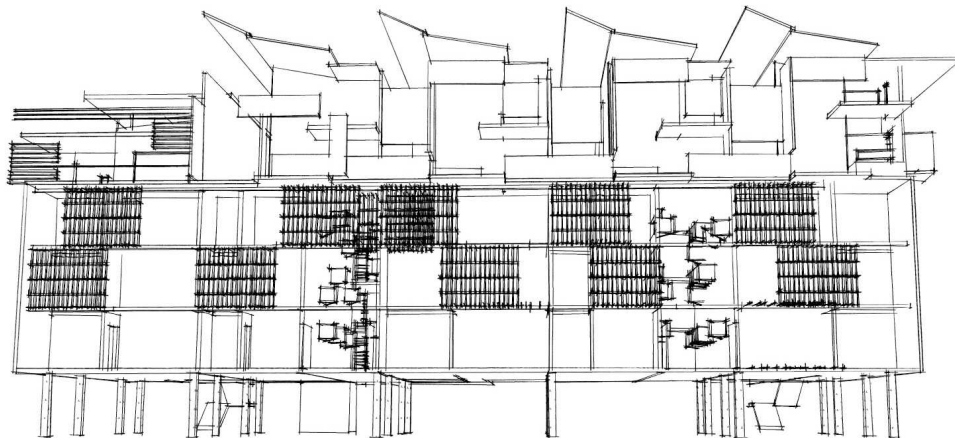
BVN Apartments and Rowhouses: Typical Section
